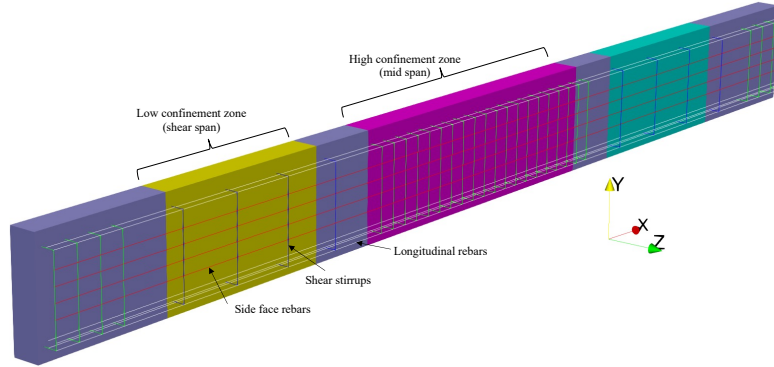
Finite element model of the USC RC beams, showing the zones with varying confinement. The front half of the concrete is clipped by the z-plane to show the arrangement of rebar, modeled as truss elements.
